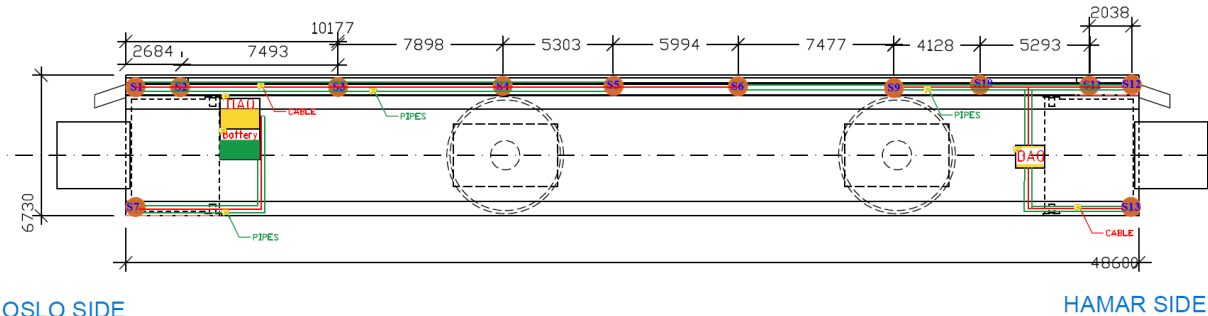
SENSOR LAYOUT FOR THE WESTERN BRIDGE
